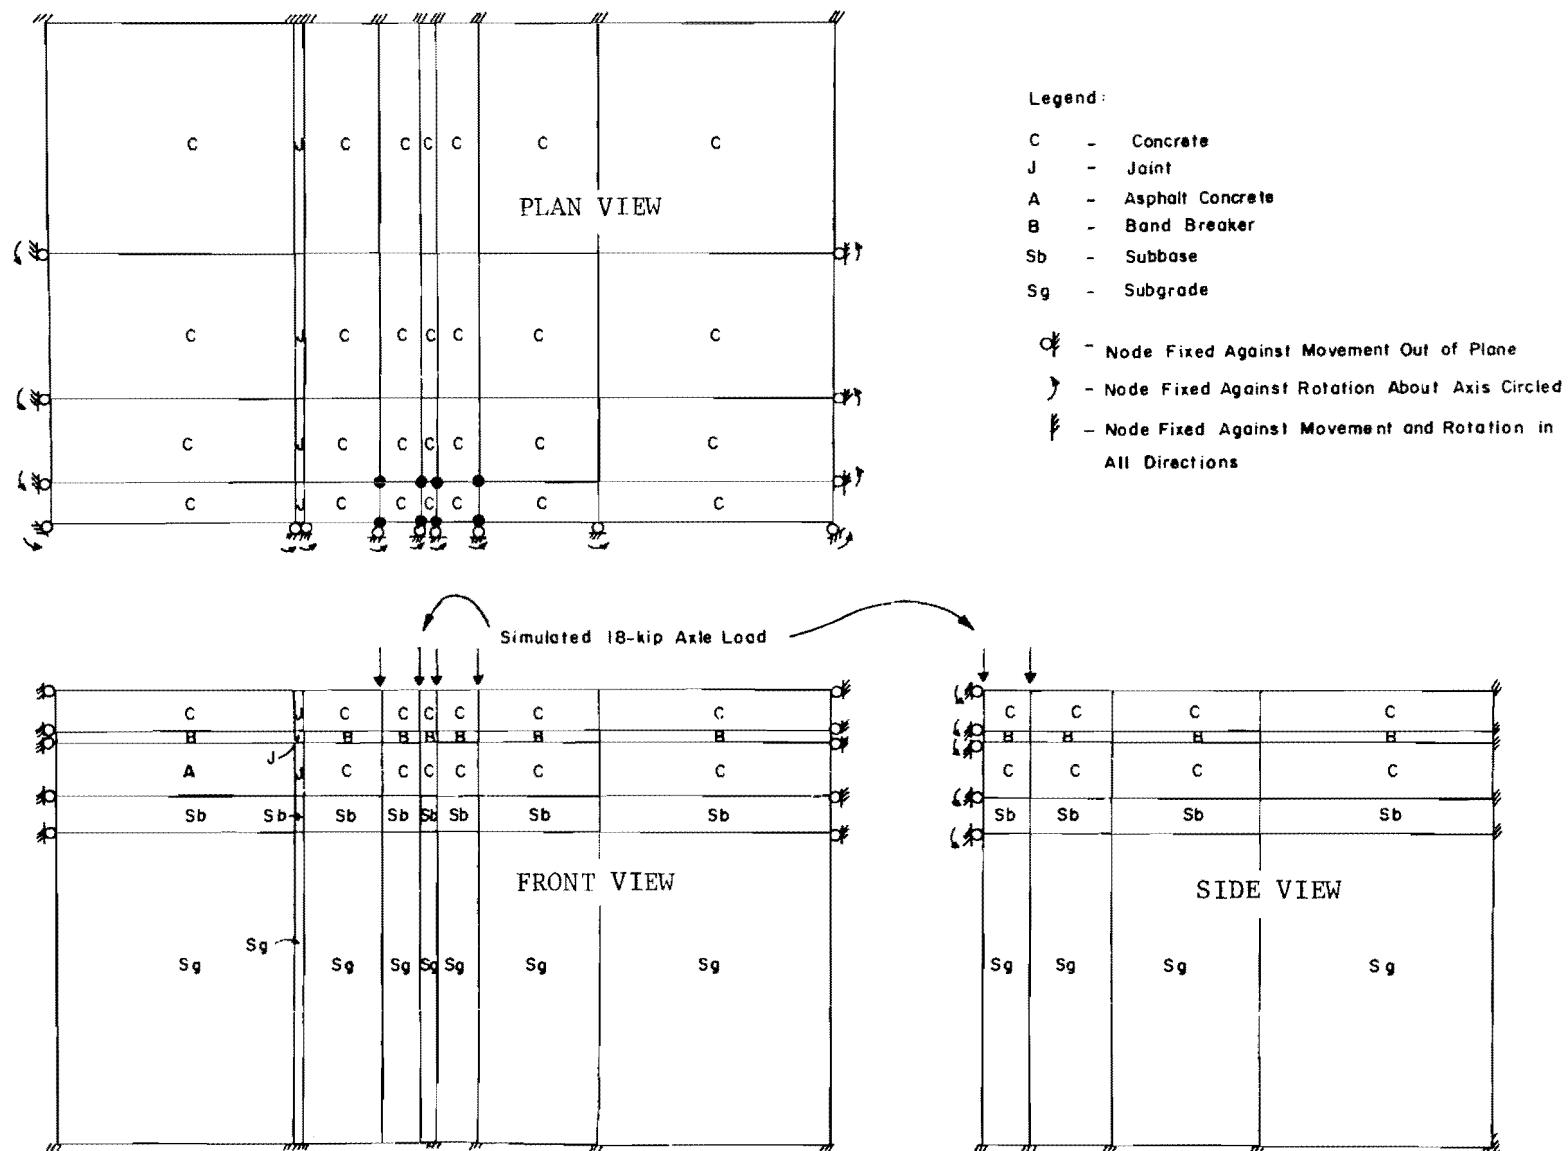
Illustration of pavement model used in SAP-2 to predict stresses for the pavement structure shown in Fig 4.10.
